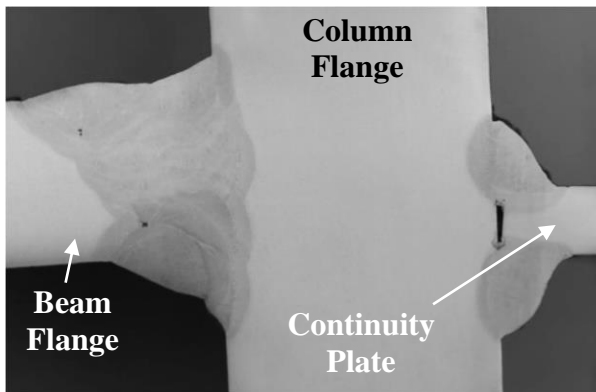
Macroetch of Specimen C3 Beam Bottom Flange CJP Weld
